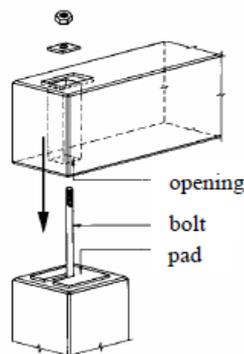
Dowel connection (Du Béton & Engström, 2008)
